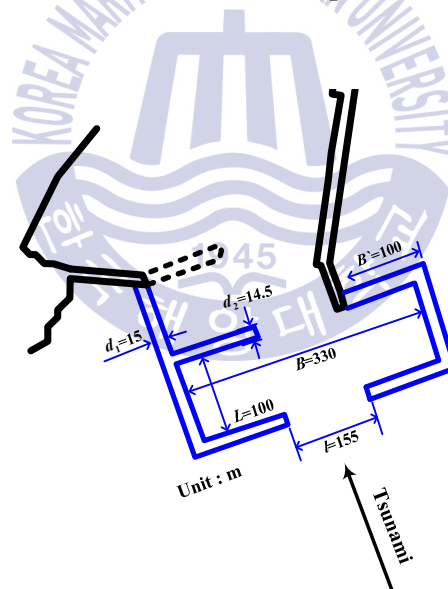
Size and shape of resonator installed to the existing breakwater of Imwon port.
